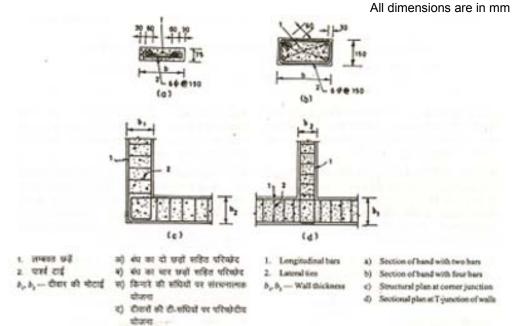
Reinforcement and Bending Detail in Reinforced Concrete Band
